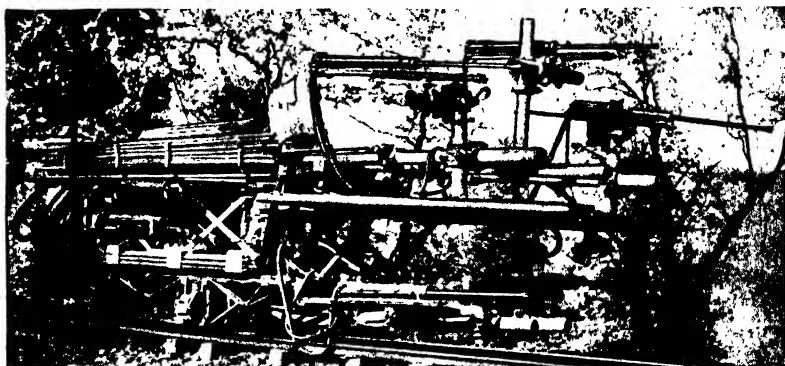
Drill carriage used on the Stanislaus Tunnel. The tunnel was 9 ft. 6 in. x 10 ft. 9 in., excavated dimensions. Note the racks for the drill steel, the extra drills hanging ready for replacement and the flood light. (Courtesy of Gardner-Denver Co.)
